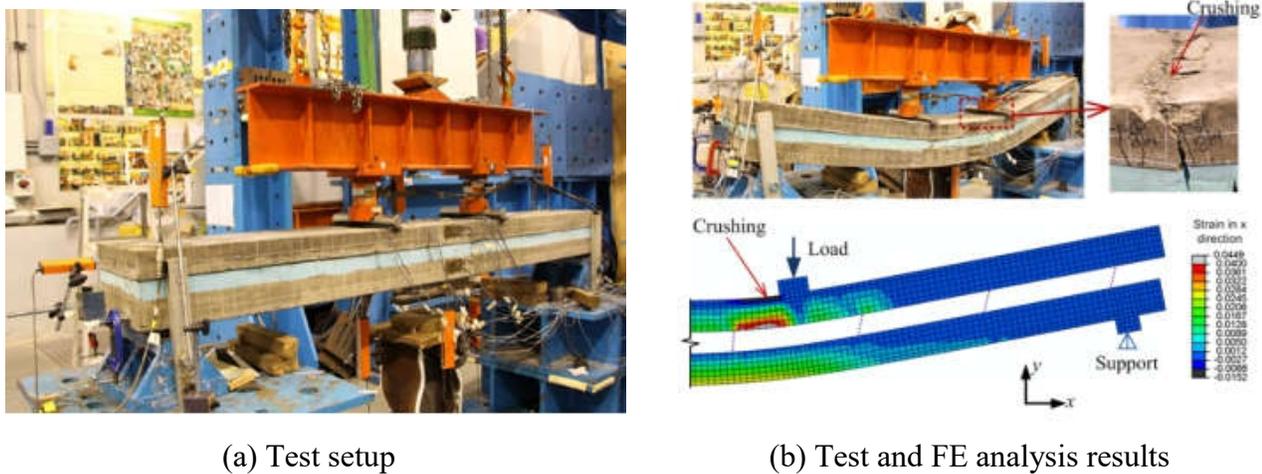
Precast geopolymer concrete sandwich panel test setup and test results
